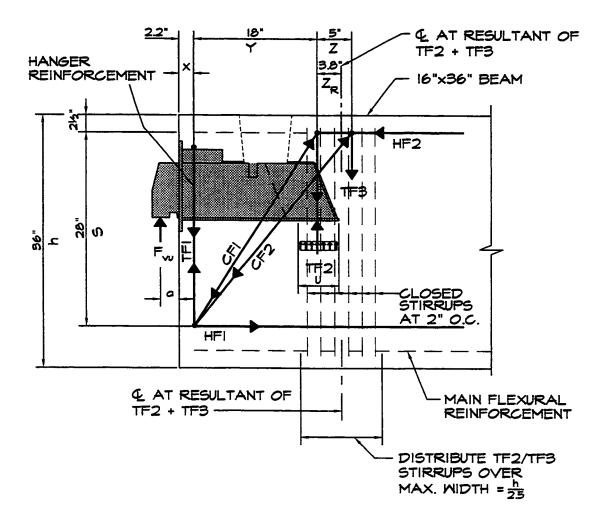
Example Beam End Truss Analogy for BSF 200/50 Connection
